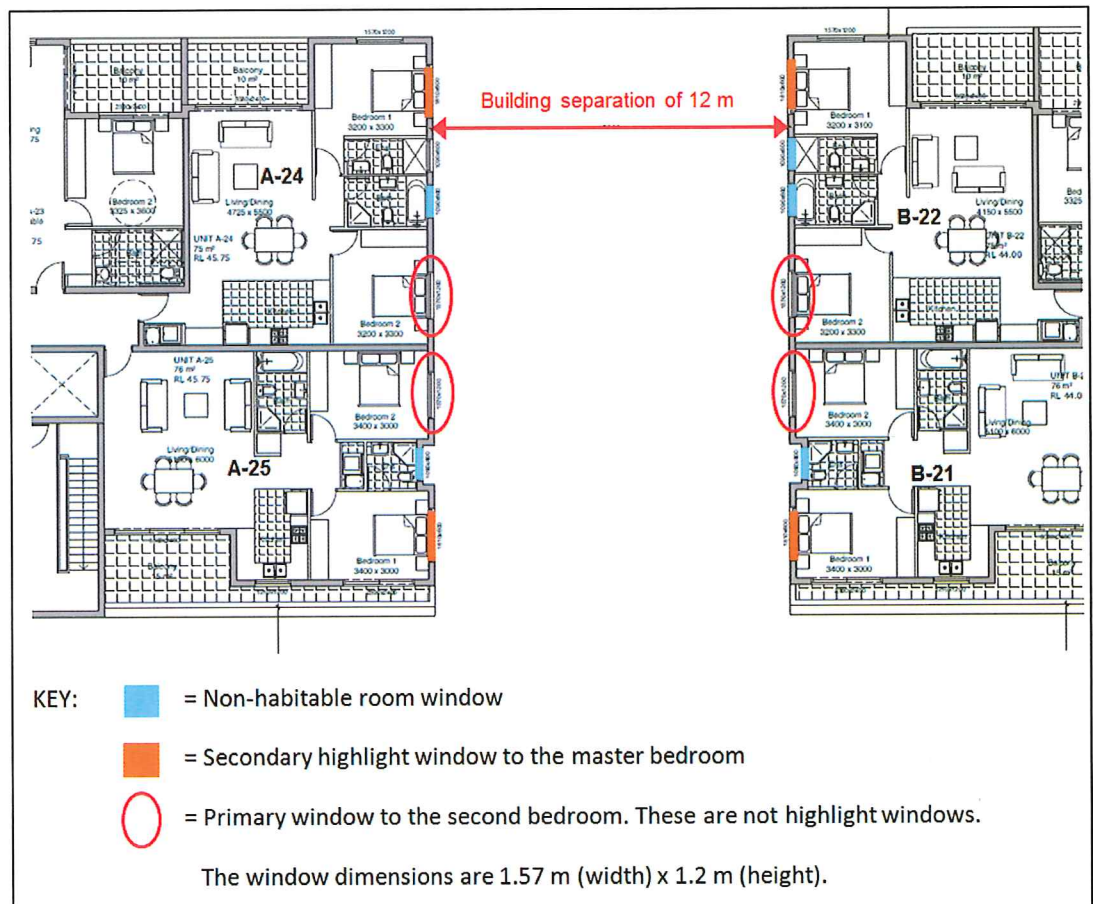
Extract from the 4th Floor Plan demonstrating the treatment to the windows for the reduced building separation.
